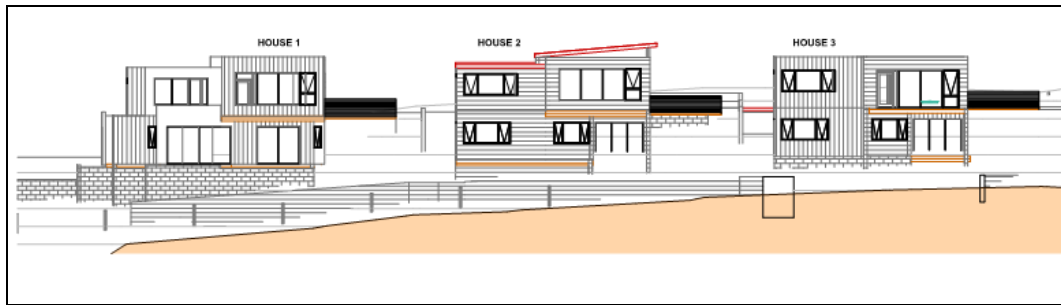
The south east elevation of dwellings 1, 2 and 3.
